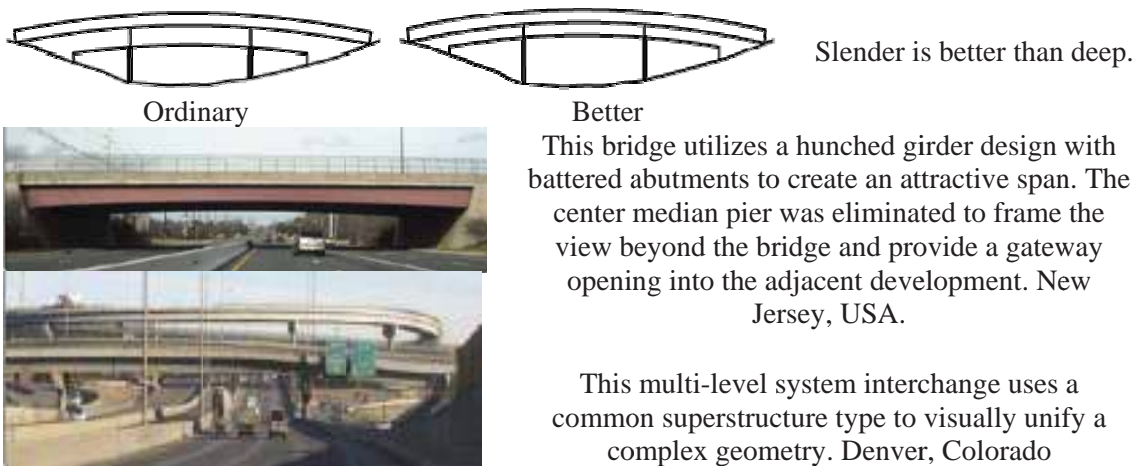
Slender Girder versus Deep Girder and Bridge Interchanges.¹
